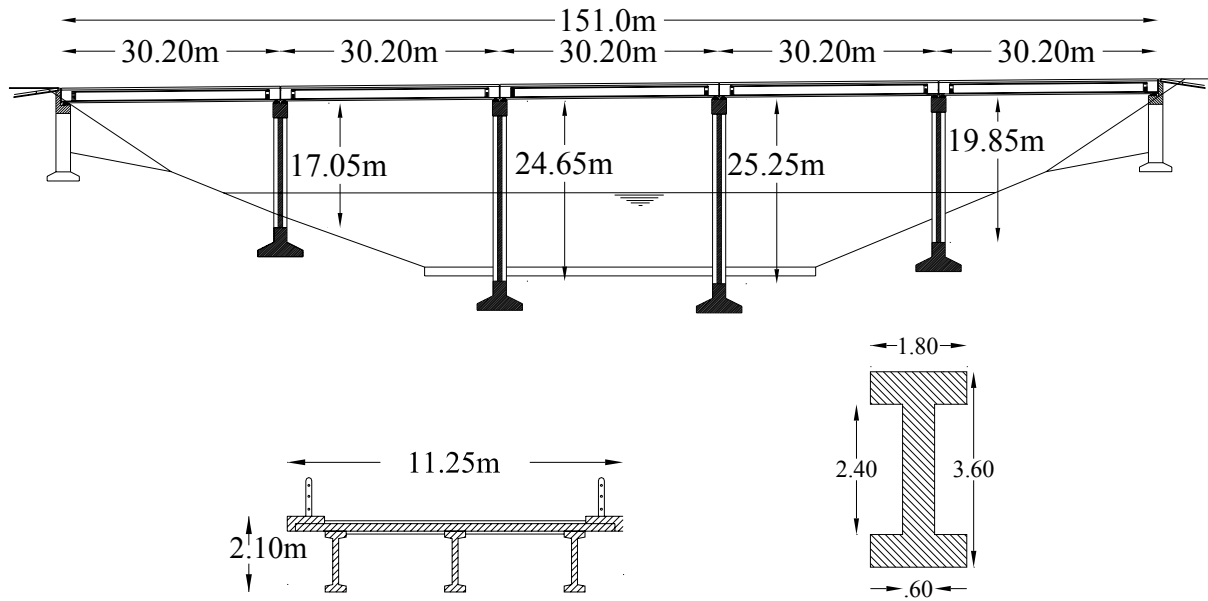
The "reference" real bridge, (a) Longitudinal section, (b) Cross section of the deck and (c) Cross section of the piers.
